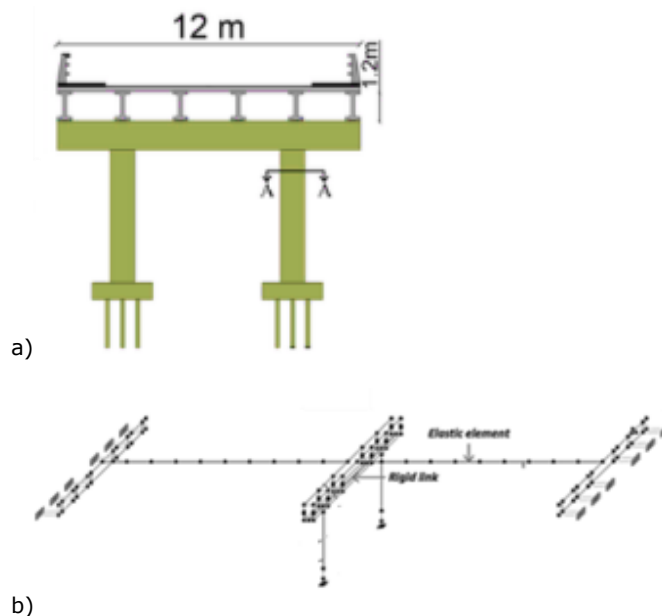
Transversal section of the bridge (a) and FE model considered (b).
